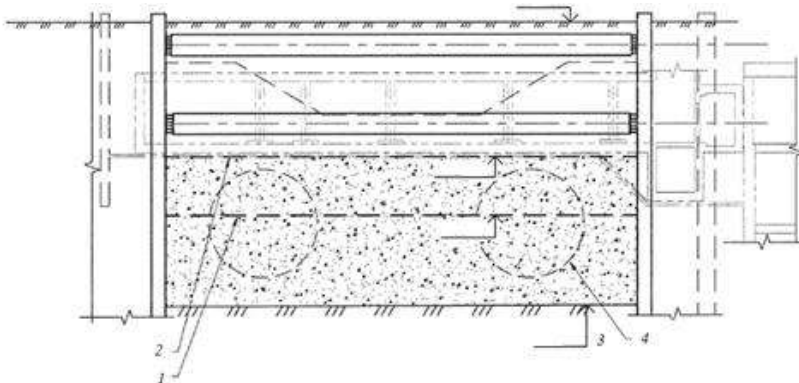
Diagram of expanded clay concrete laying and backfilling: 1 – first stage of expanded clay concrete laying; 2 – second stage of expanded clay concrete laying; 3 – excavation depth mark; 4 – TBM rotor dimensions.
